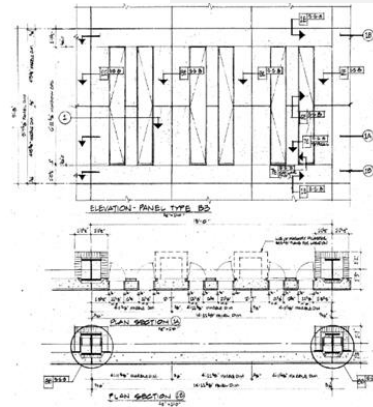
Original drawings “Slit Windows” elevation and plan section⁸.
